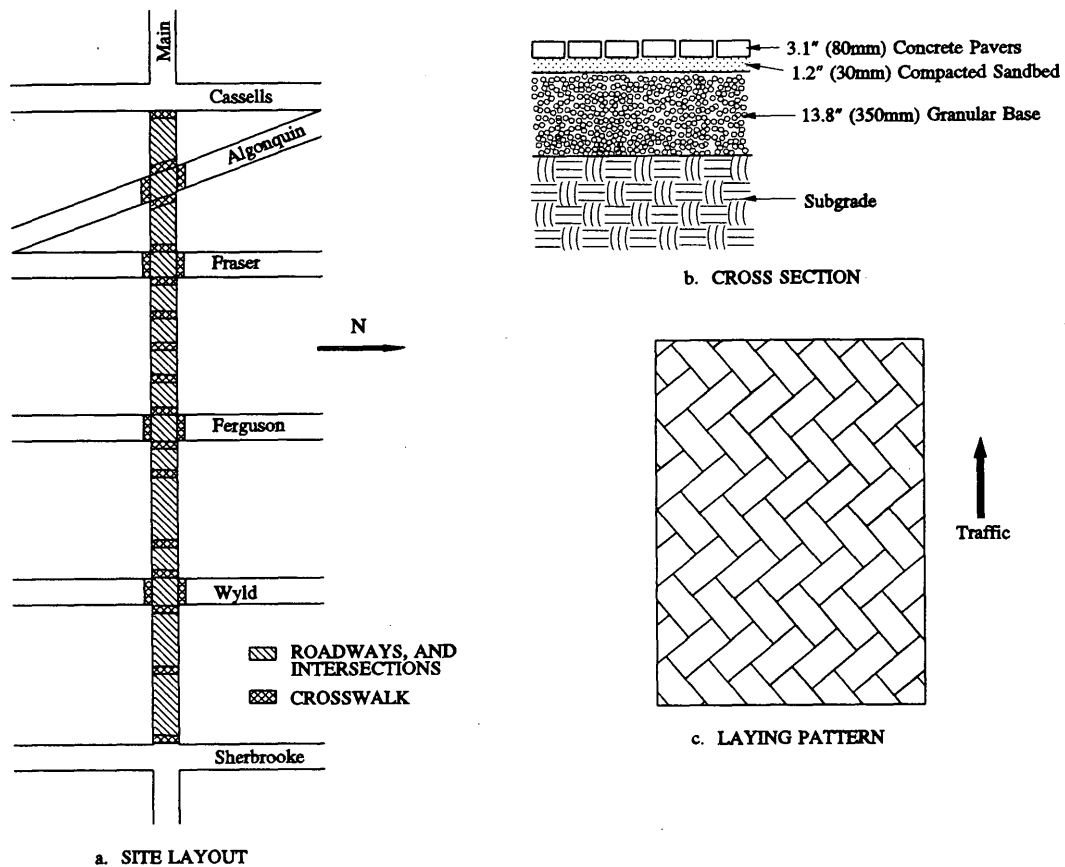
Timmins, Ontario: site layout, pavement cross section, and laying pattern.
